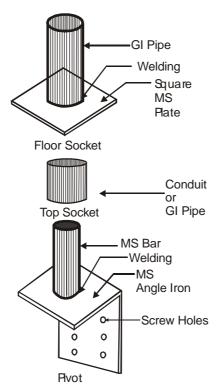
Detail of Fixing Shutter to RC Door Frame
